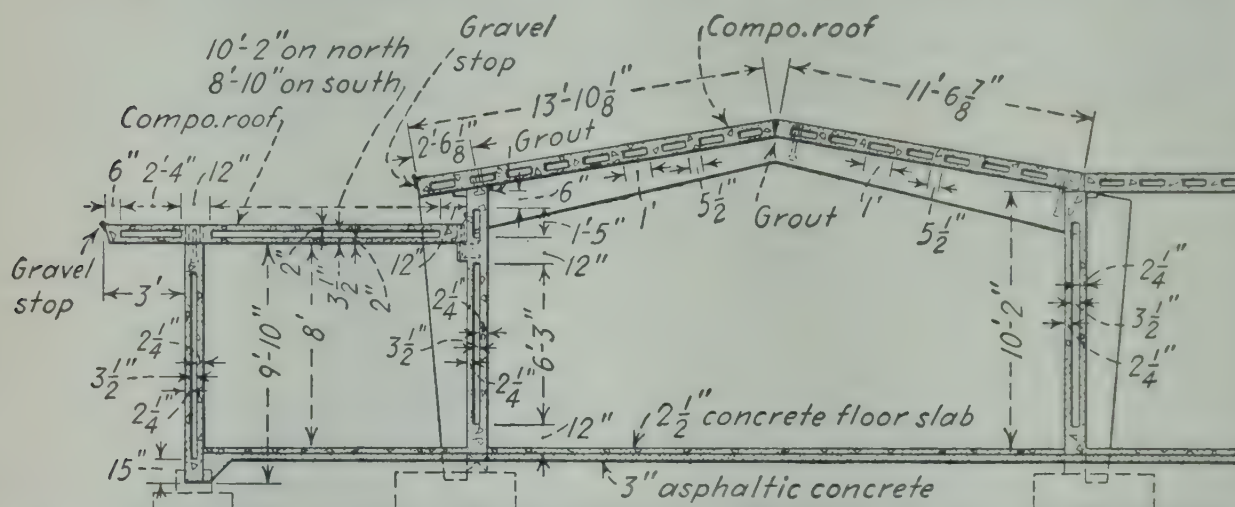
Hollow precast-concrete slabs used for walls and roofs of one-story infirmary buildings at Los Angeles County Hospital. (*Eng. News-Record*, Mar. 8, 1951.)
